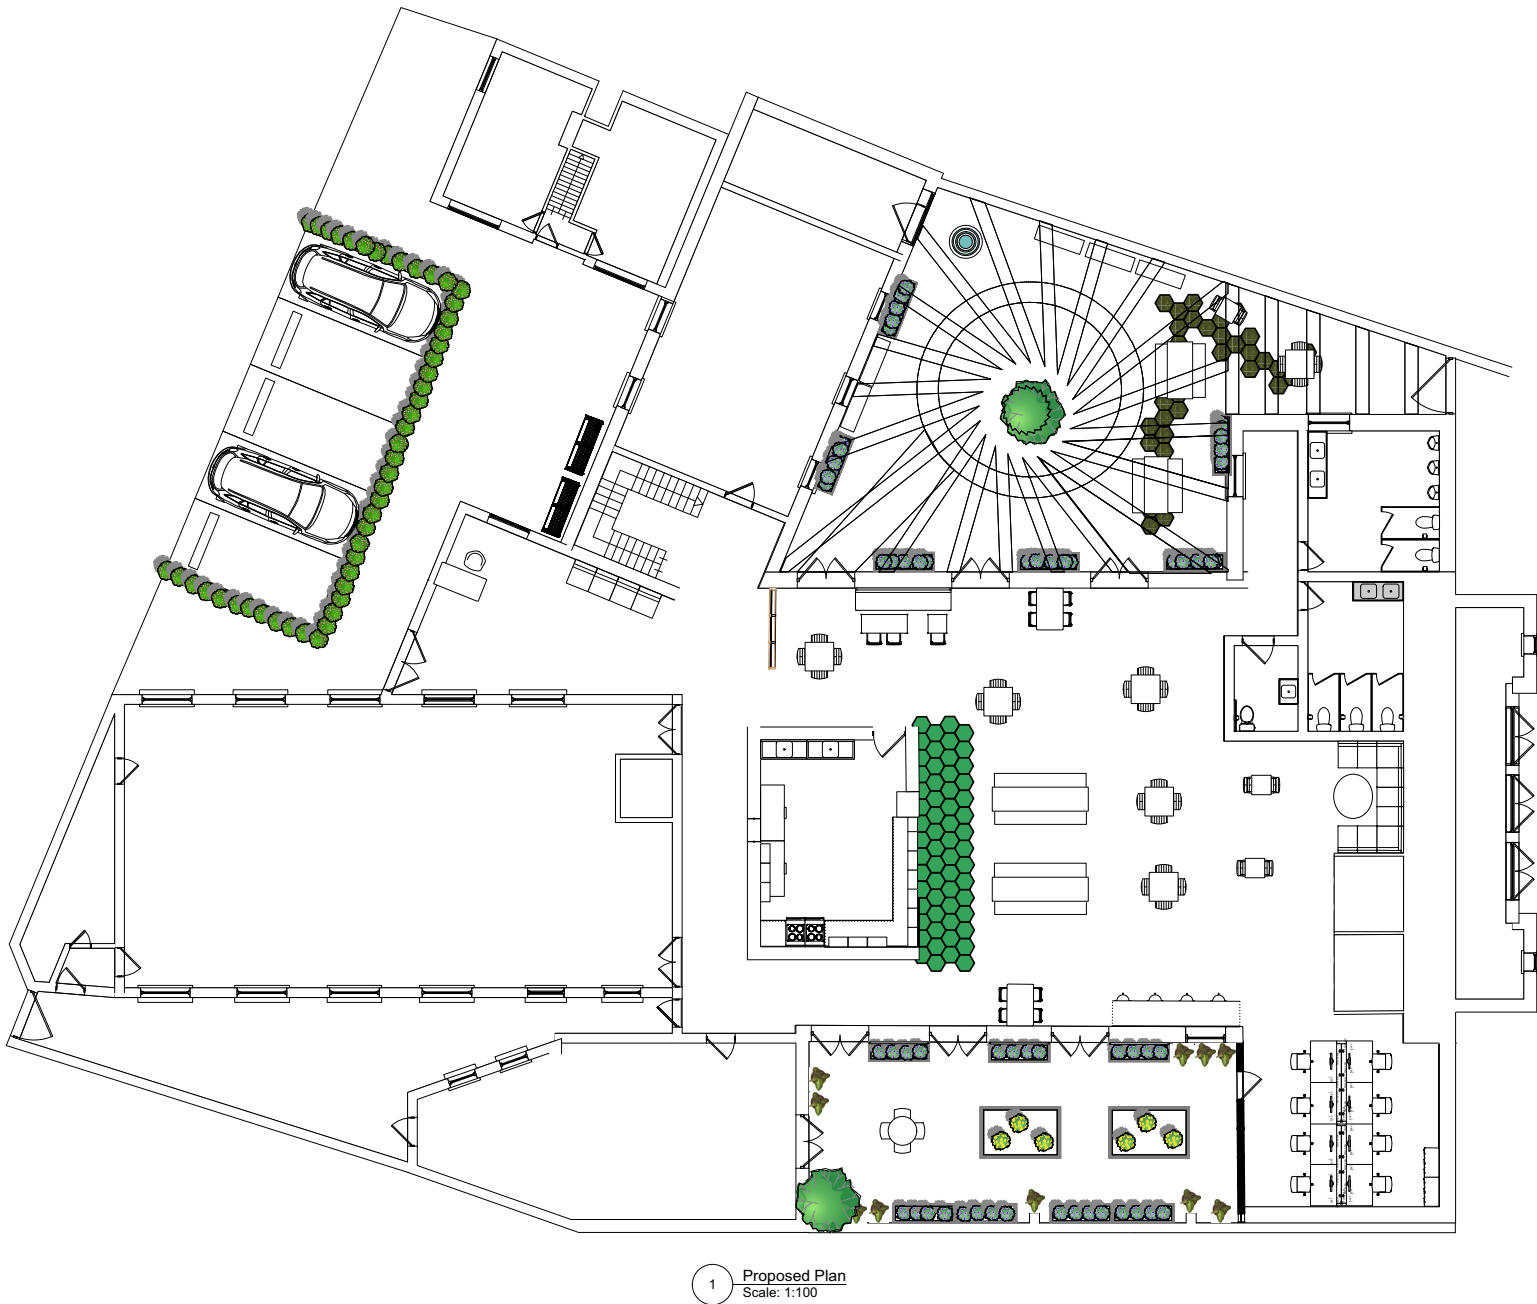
Authors work showing the floor plans of a project that brings the outside design indoors, (Burton, 2018)
